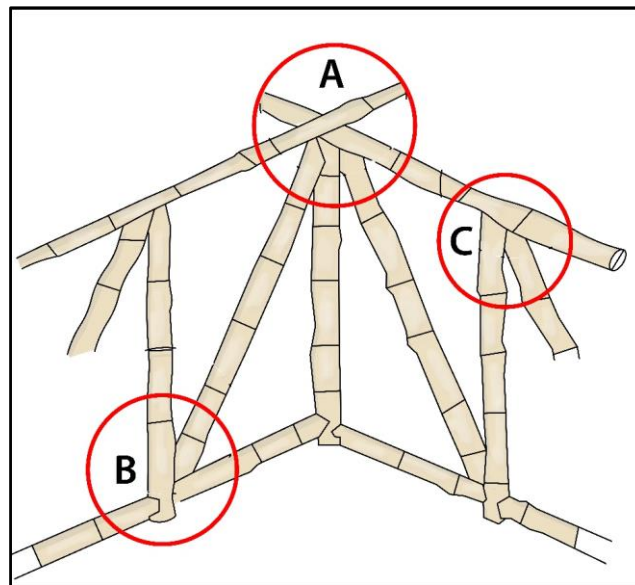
(A) BAMBOO/BALLI WALL FRAME
